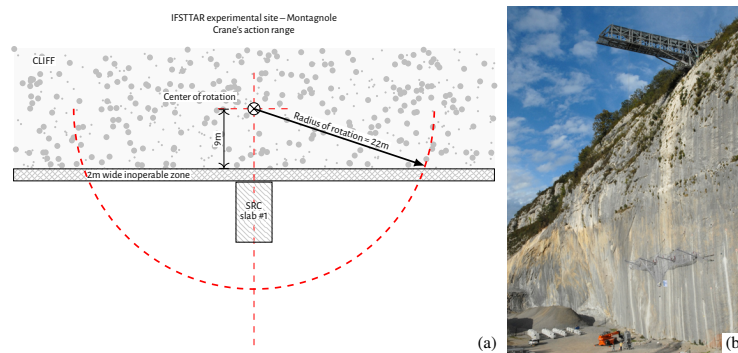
Schematic plan view (a) and picture (b) of the Gustave Eiffel's full-scale rockfall experimental testing facility in Montagnole, France.
